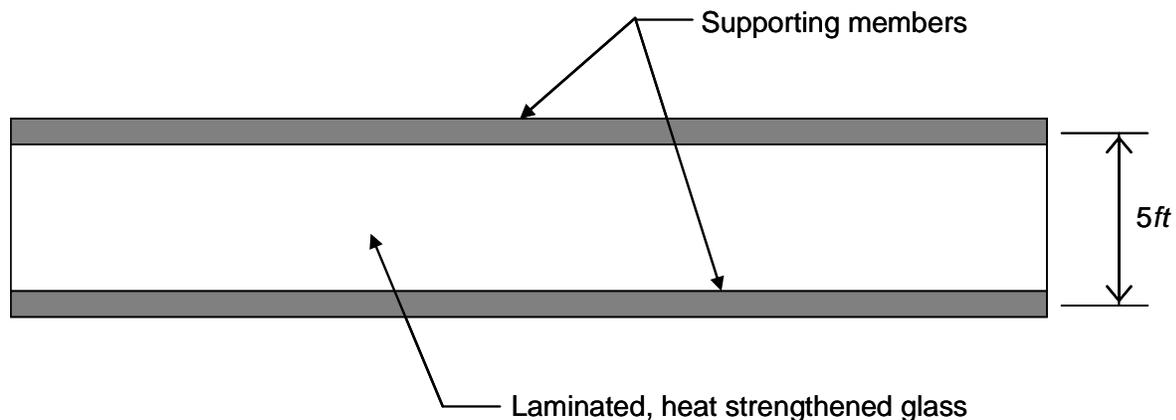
Sketch of Floor for Example Problem (Personal Picture)
